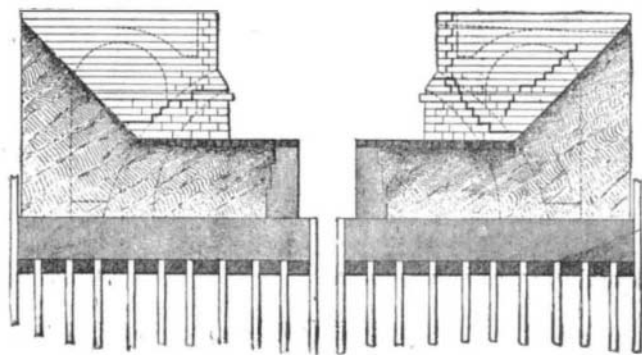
SIDE ELEVATIONS OF PIERS OF SAME.
